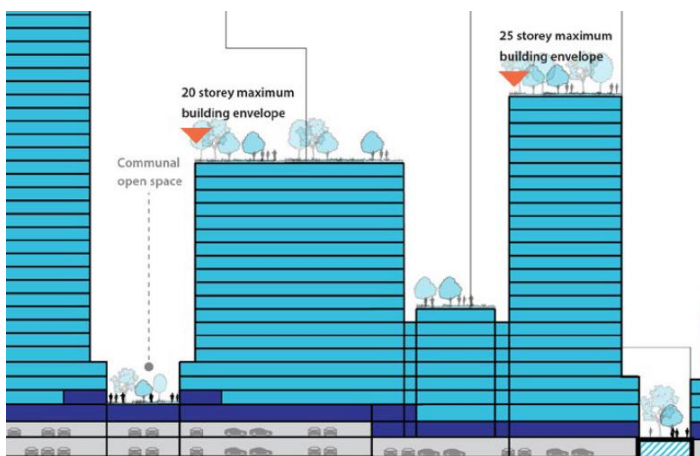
from CB DCP 2023 showing a north-south section through the site envelope
